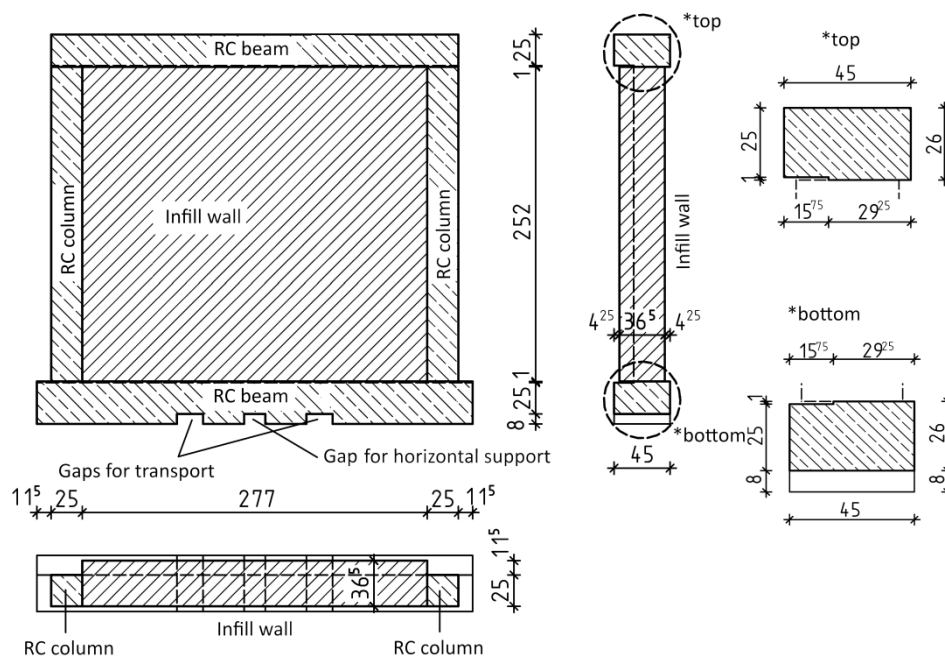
Reinforced concrete frame with masonry infill made of MZ70 bricks
